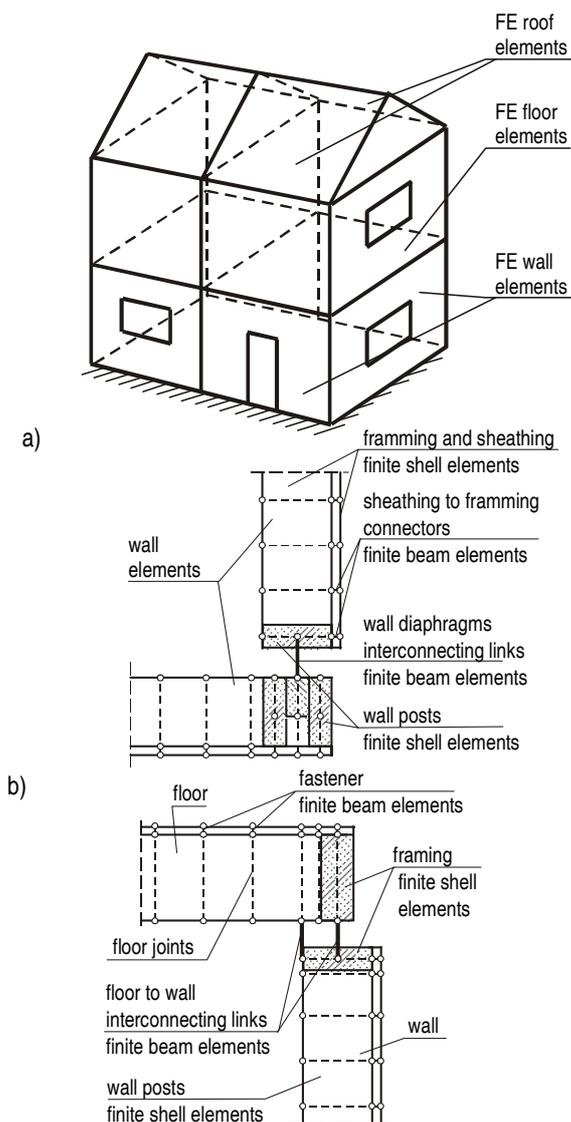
Modelling the building and joints a) walls at the corner, b) floor to wall
